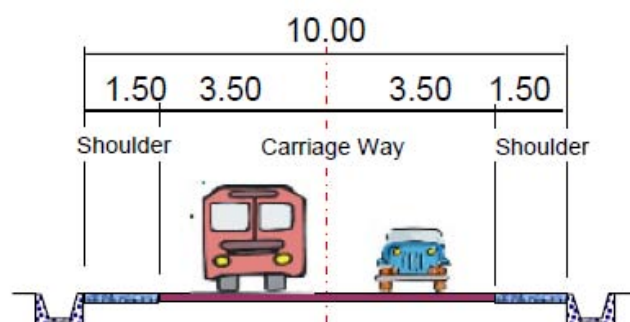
Typical Cross Section of Tj. Bunga - Takalar
